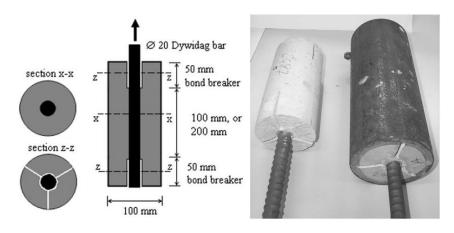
Pull-out test specimen (Geroge, Sand M. Berra. 2010)
